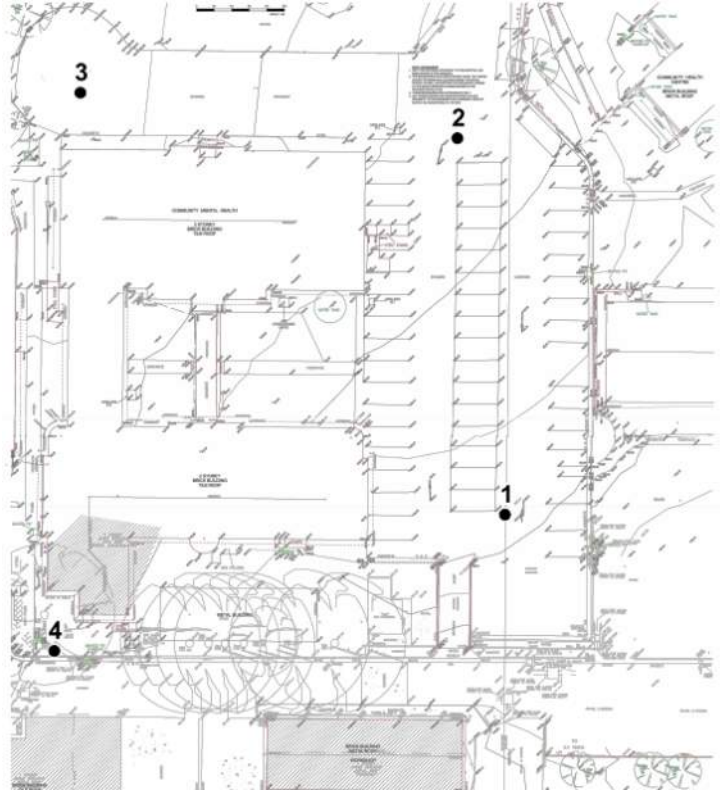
Extract of BOREHOLE LOCATION PLAN (Source: JK Geotechnics Initial Geotechnical Investigation Ref: 30116V1rpt Goulburn, Dated 26 April 2017)
